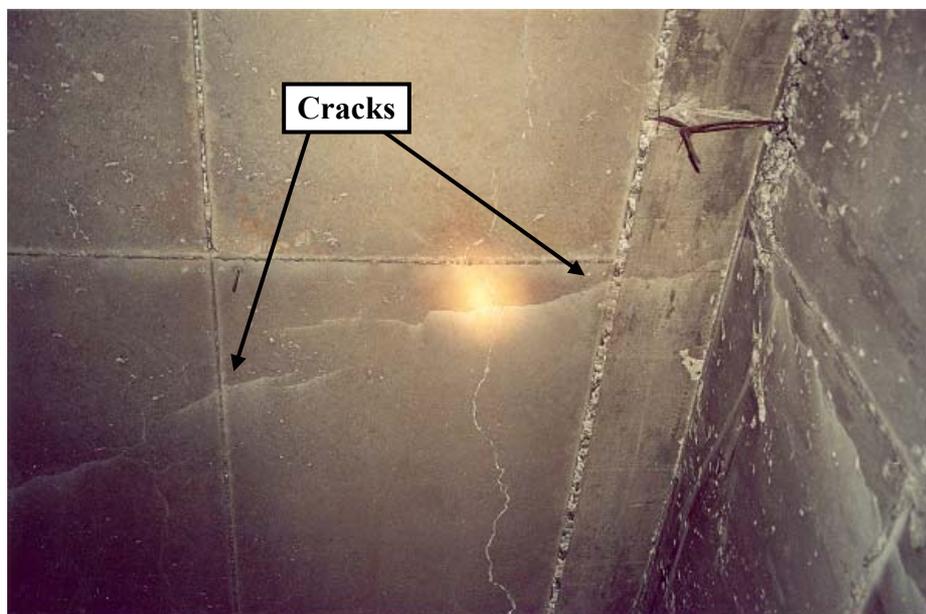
Roof cracks, perpendicular to culvert axis, between stations Y6 and Y10
